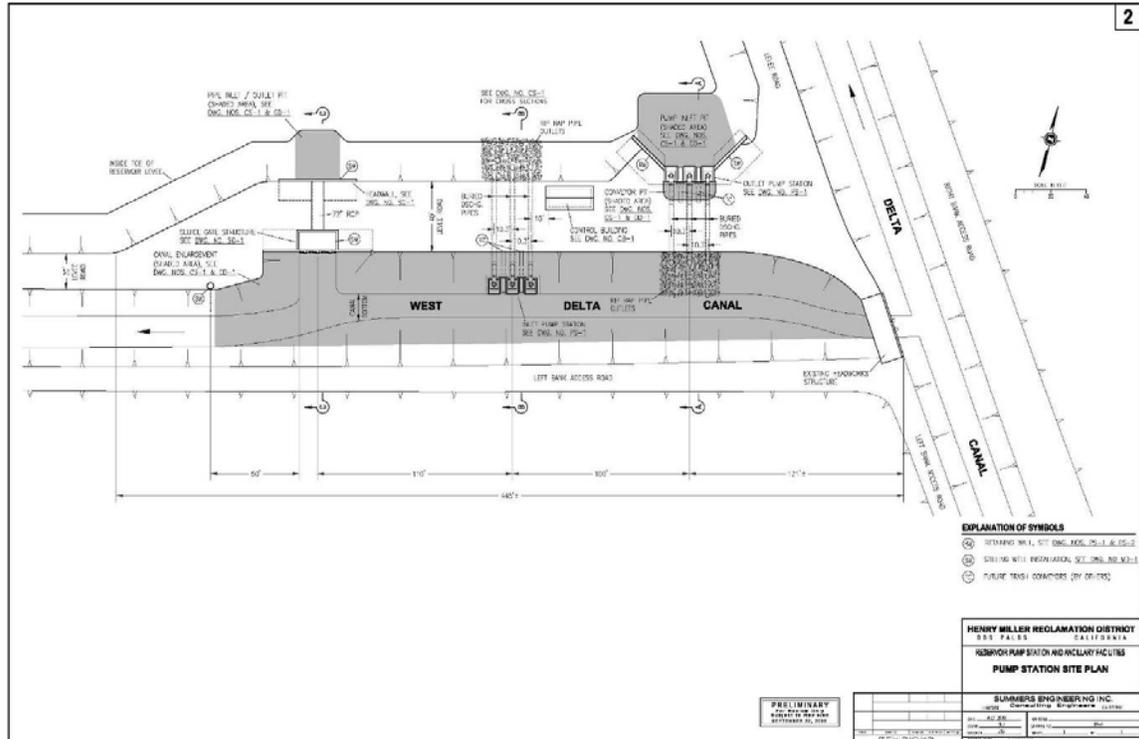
Site plan drawing of the Central Reservoir Inlet/Outlet facilities
